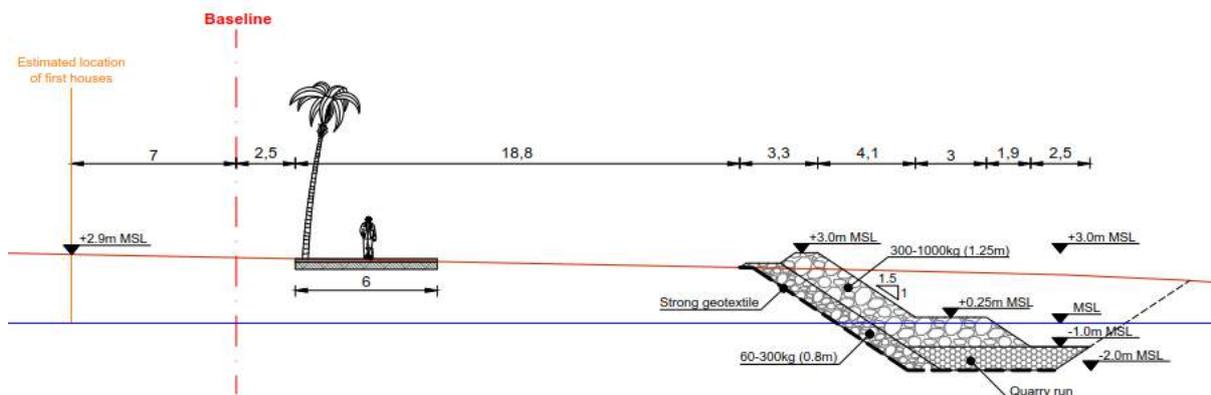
Principle cross-section revetment light - West Point (Alternative A) - Chainage 100 m
